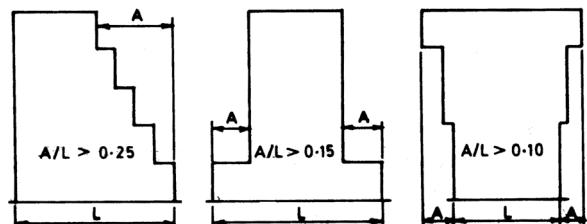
TYPICAL SHAPES OF BUILDING WITH SEPARATION SECTIONS
